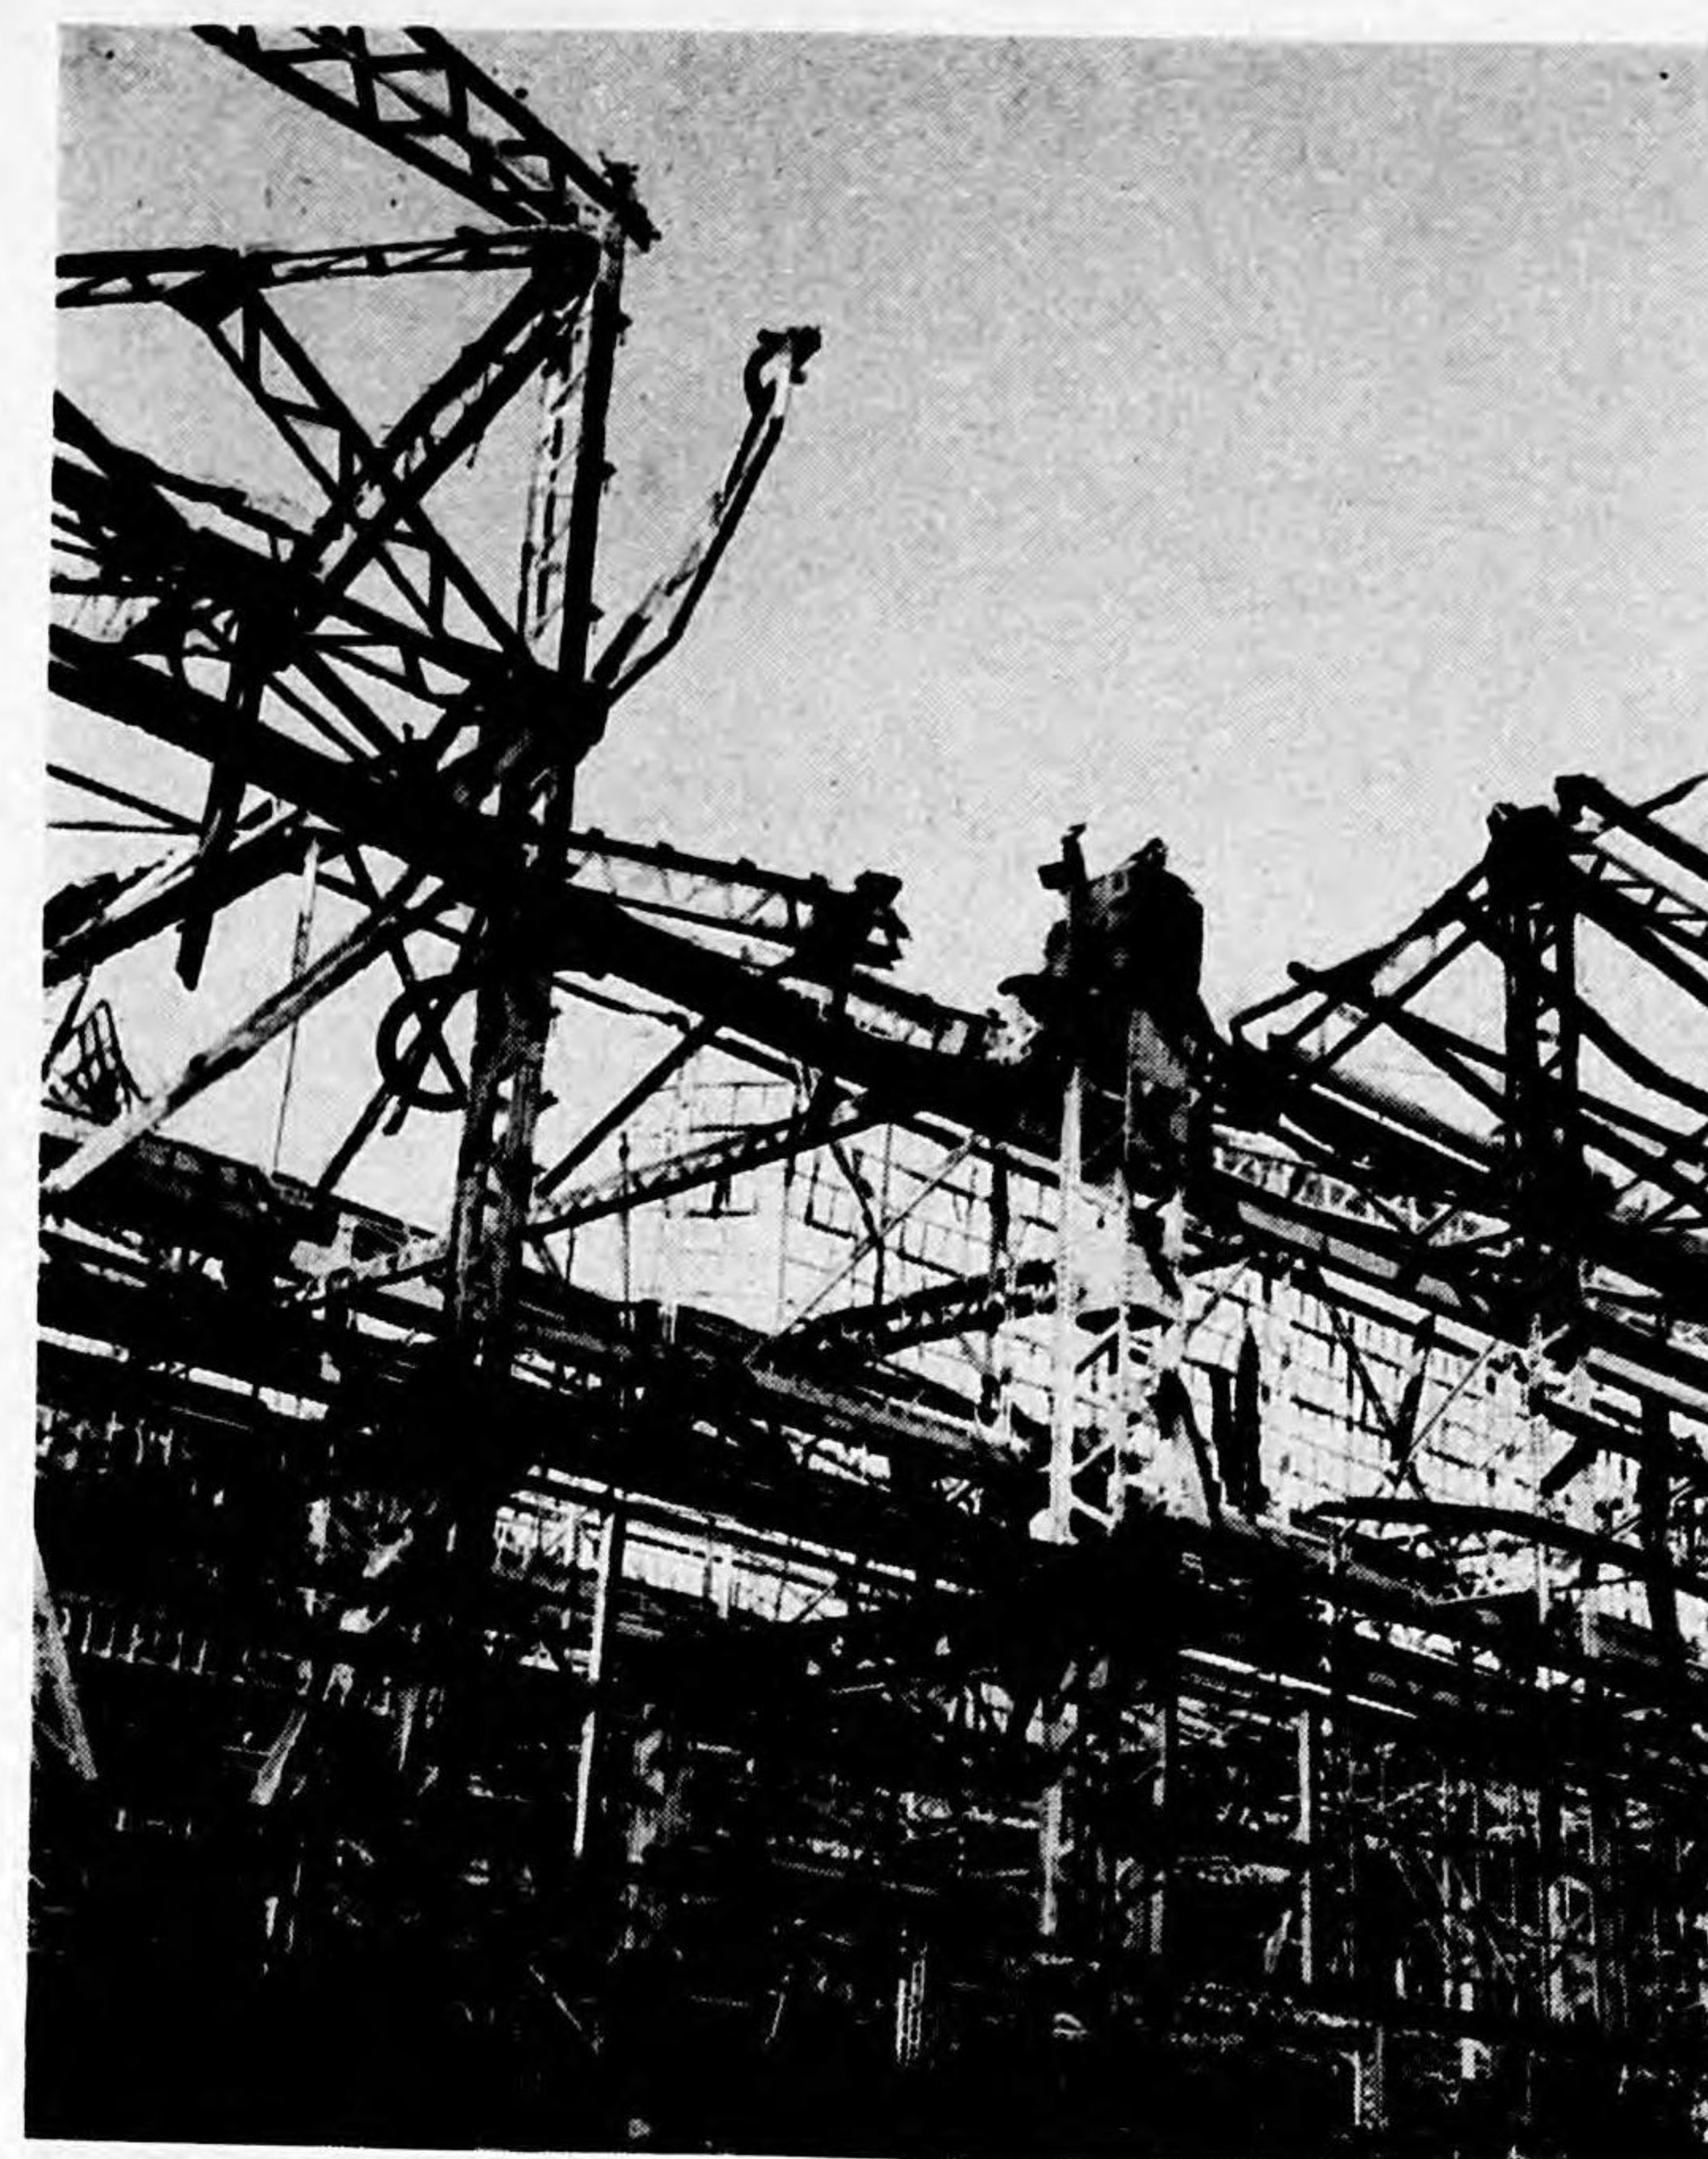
Building 3, Bomb 10; exterior column cut; roof steel damaged.
